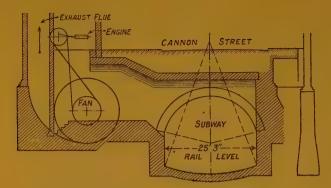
Ventilation equipment as originally constructed under Cannon Street, London.
